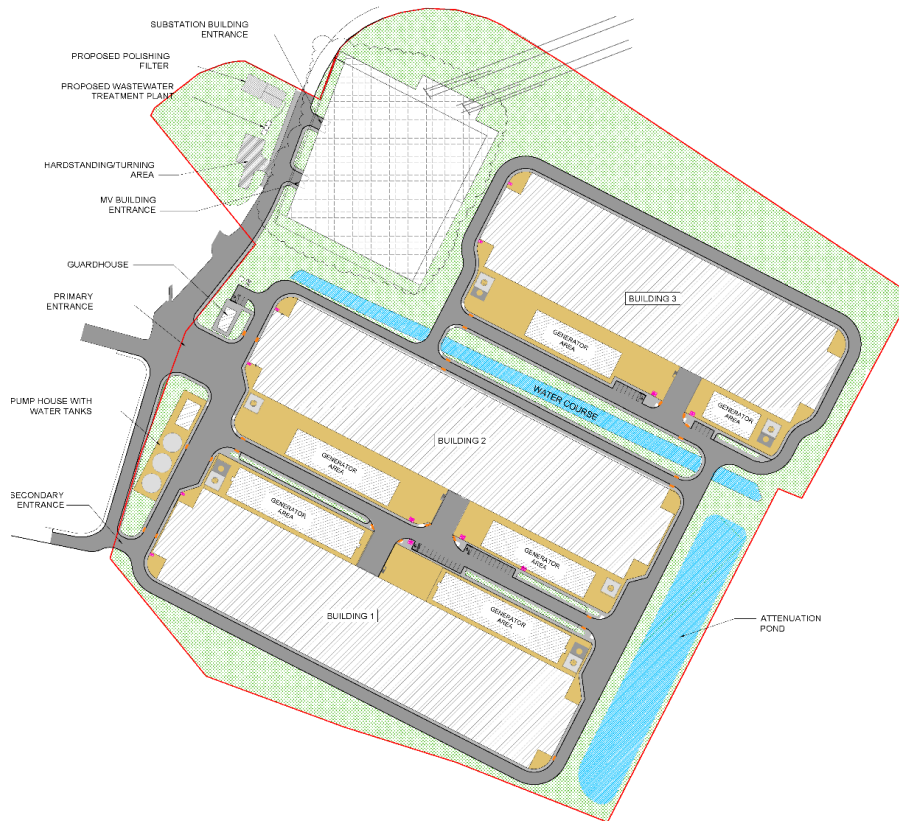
Site layout plan for the adjoining permitted data storage facility development
